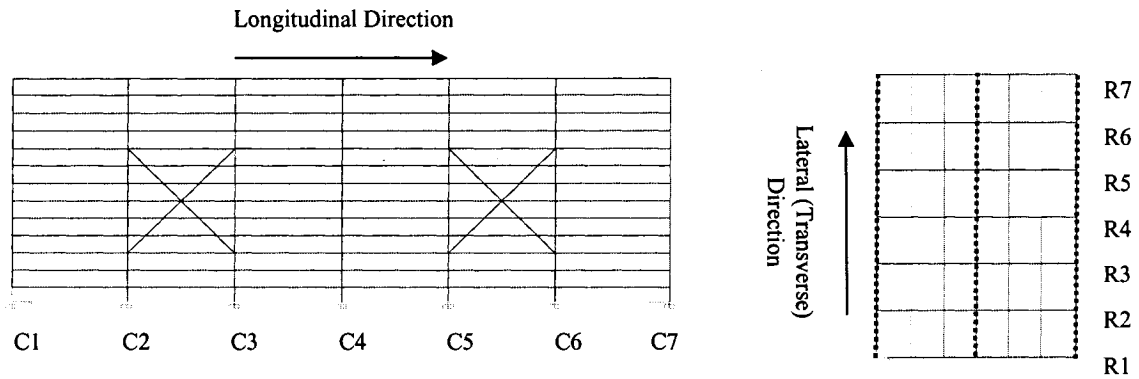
2D Elevation and plan views of the model, column and row labels
